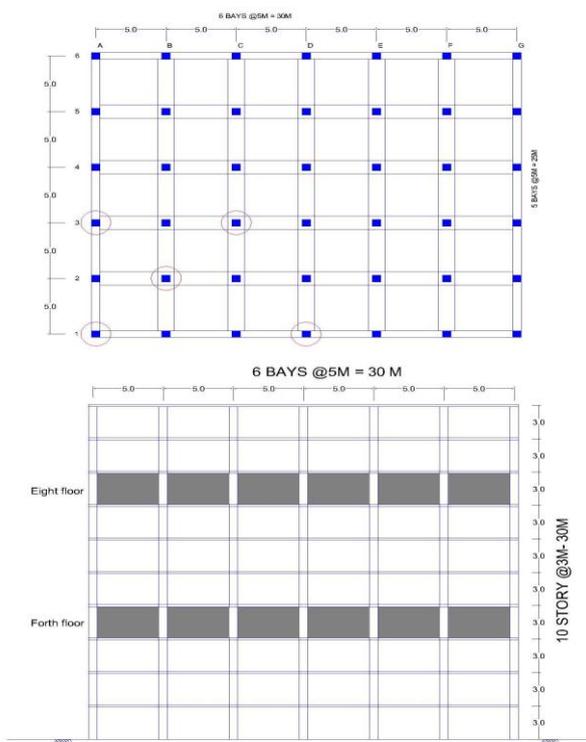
plan and elevation view of studied Vertical irregularity flat slab having Mass irregularity as case no 5.
